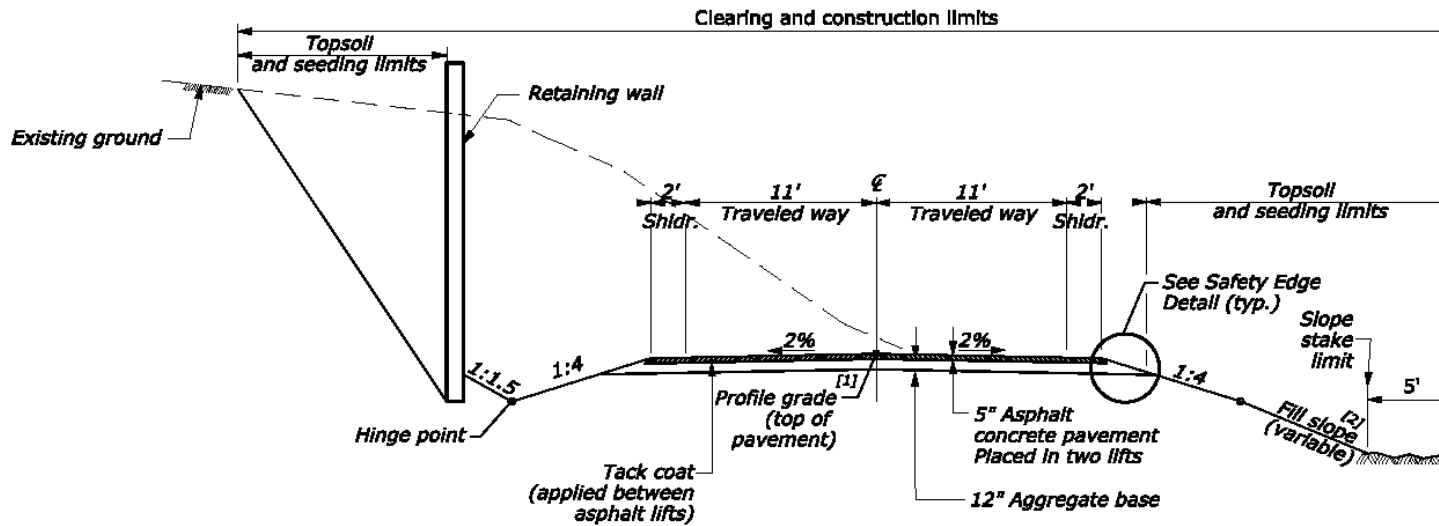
Cape Meares Road Relocation Project – Preferred Alternative Typical Cross Sections
